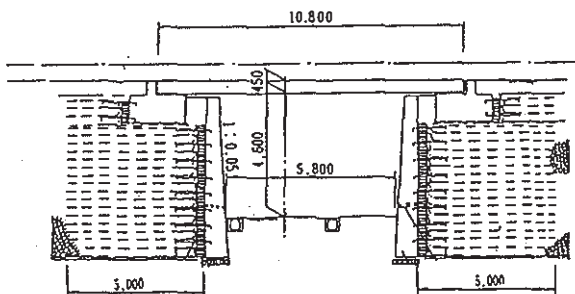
Cross section of geosynthetic-reinforced soil bridge abutments at Shinkansen Yard, Nagoya (Tateyama, et al., 1994).
